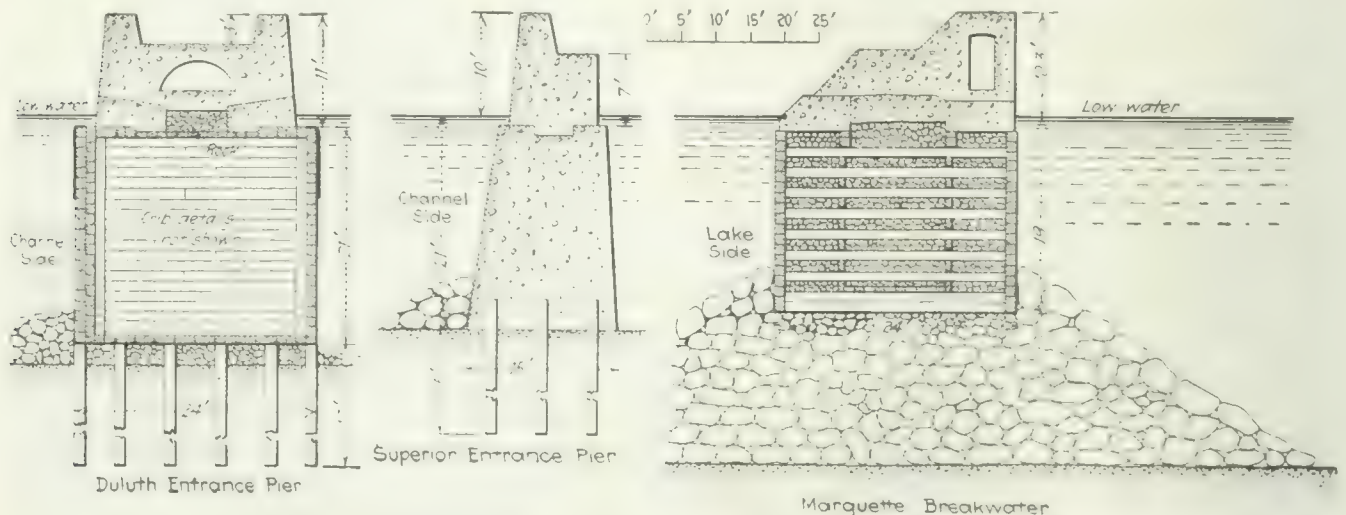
EXAMPLES OF CONCRETE PIERS AND BREAKWATER
